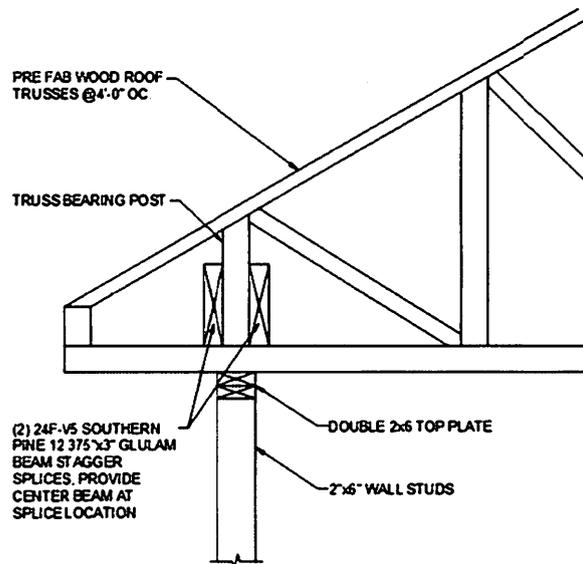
Exterior Load Bearing Wall Removal, With Window
